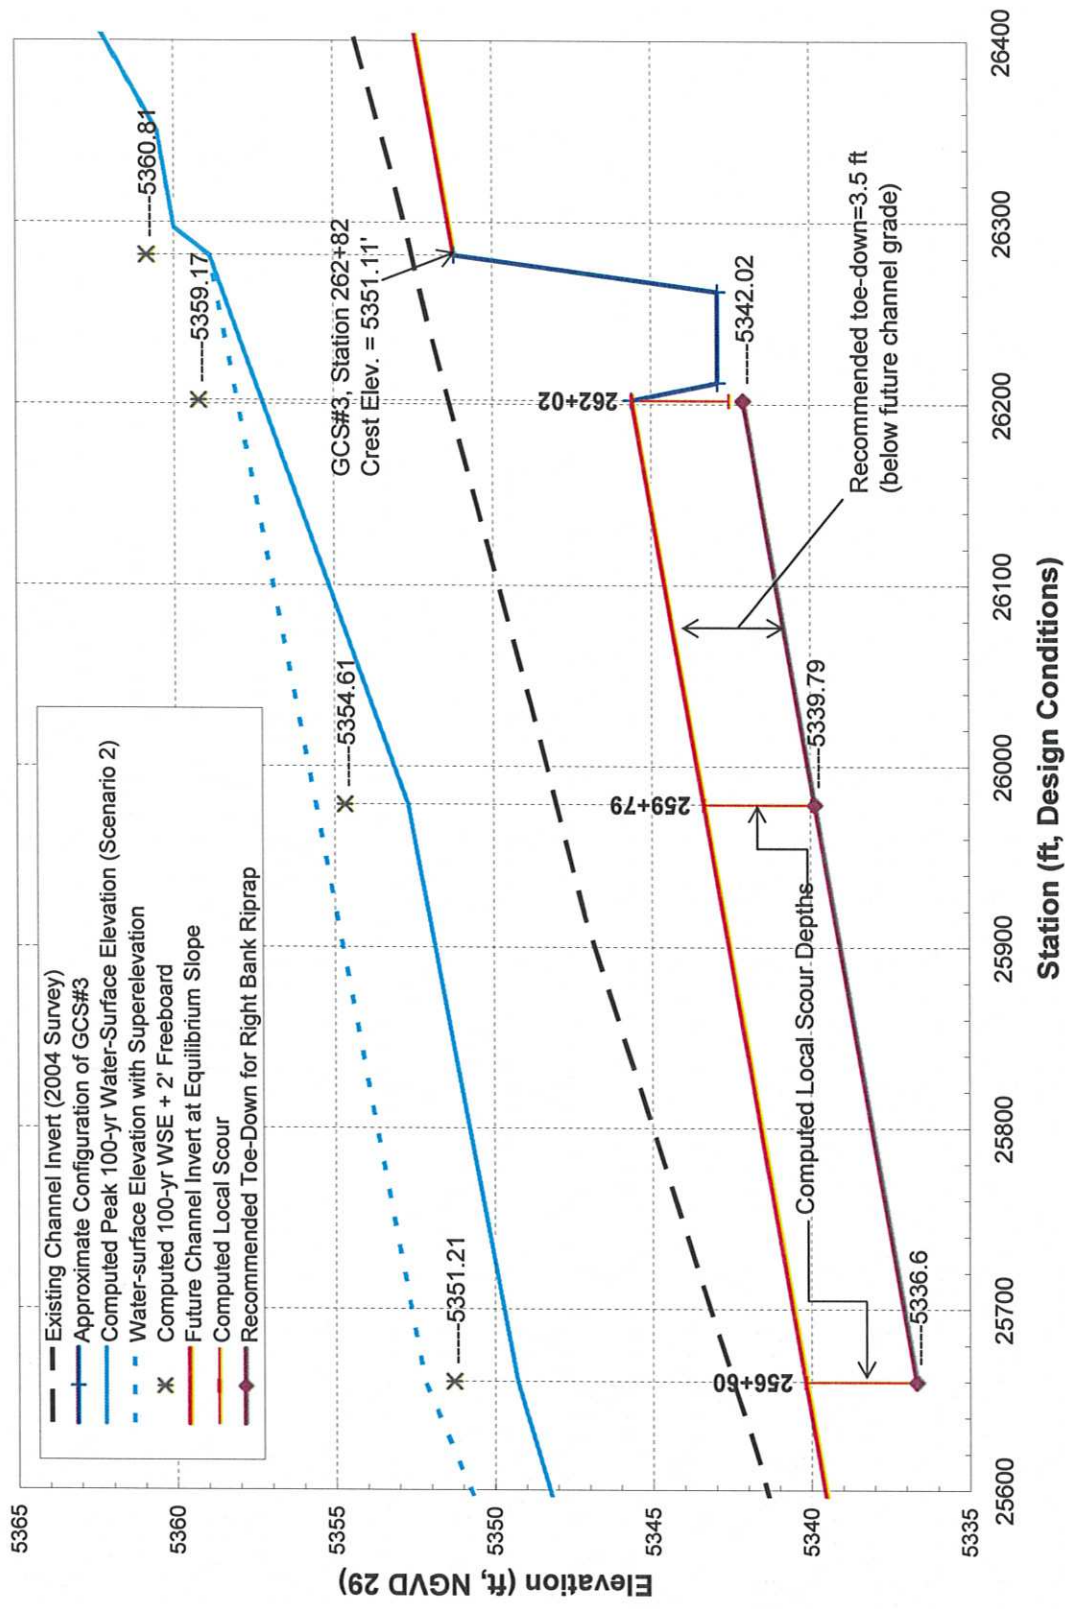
Longitudinal profile for the right bank riprap located downstream of the McMahon Boulevard bridge crossing.
